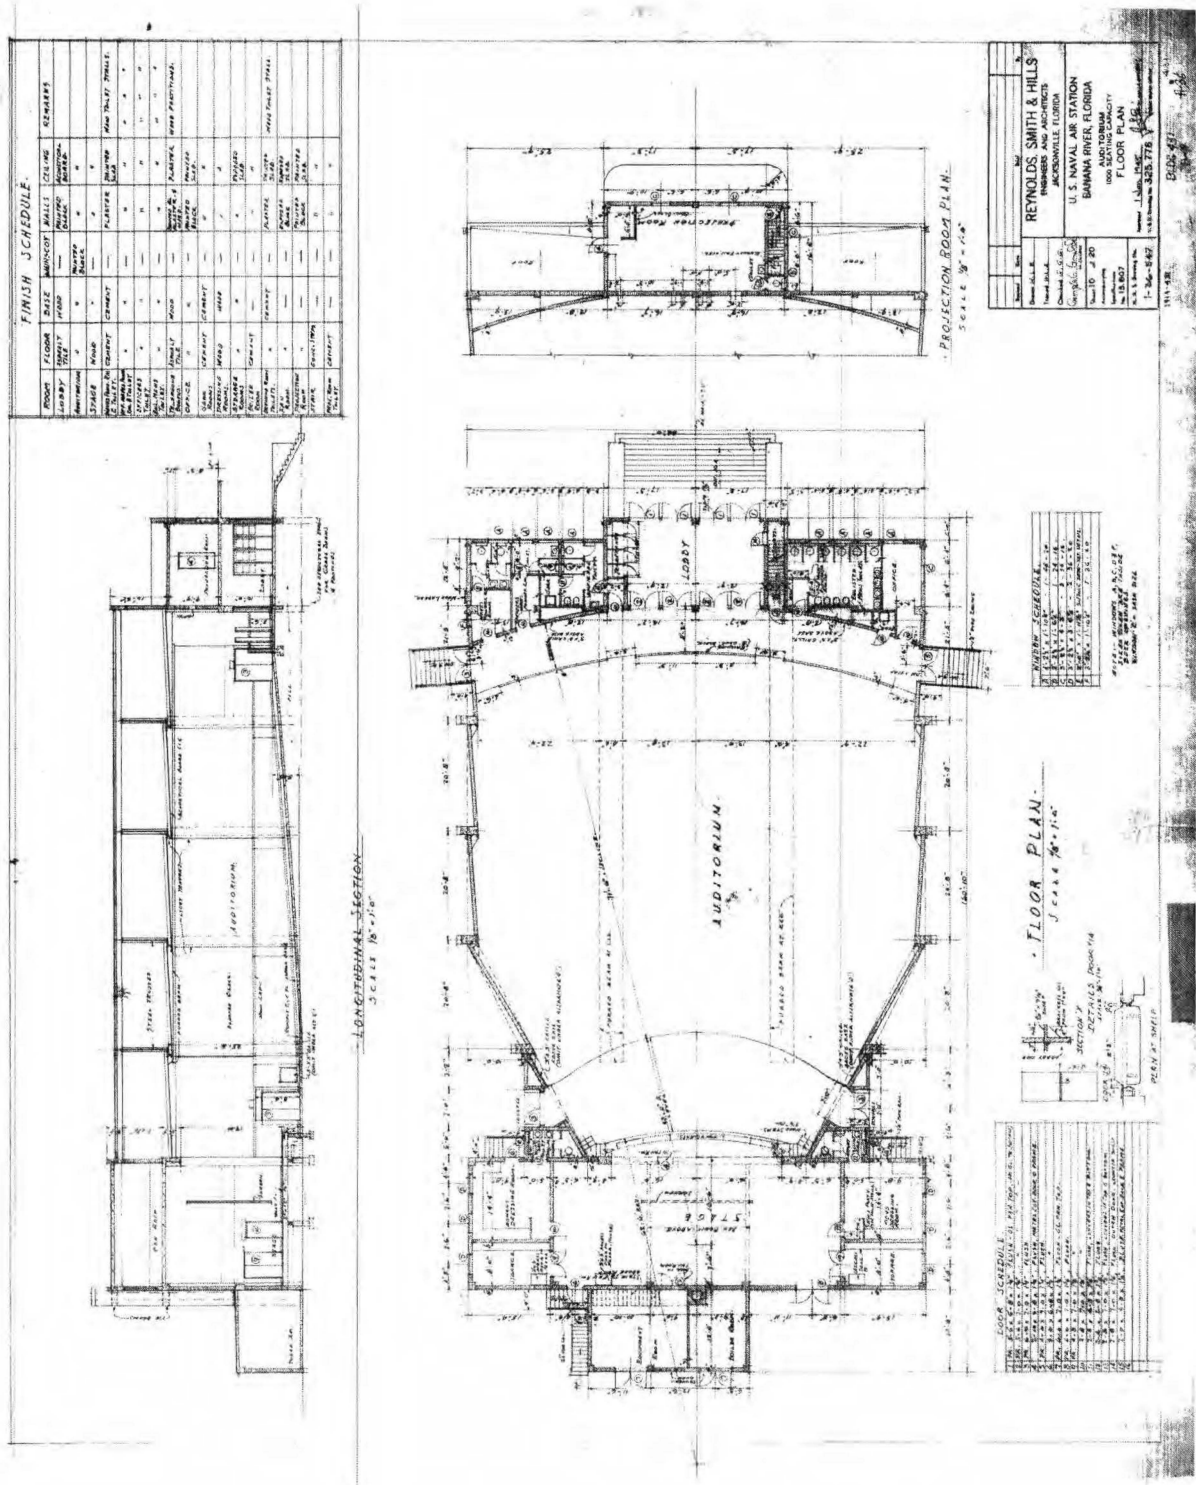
Floor Plan, Auditorium, U.S. Naval Air Station Banana River, Florida, 1 January 1945.
